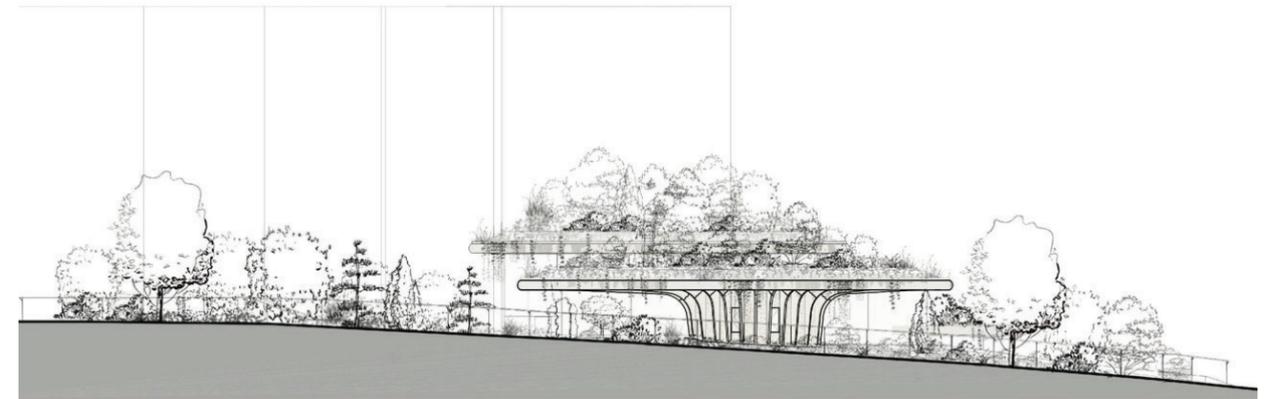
| Heatherwick Studio, photo credit | Longitudinal Section Cut
